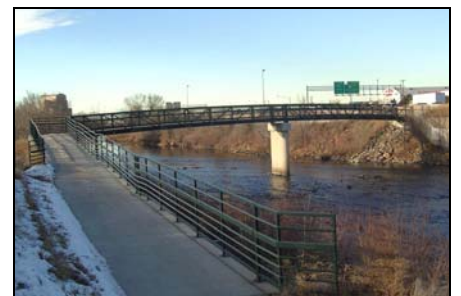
New pedestrian bridge near 1st Avenue (extended) in Denver
